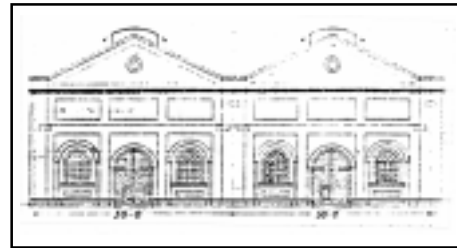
Elevation showing brickwork detailing to gable end walls and the arrangement of doors and windows. Source: SRAO ELW3.
